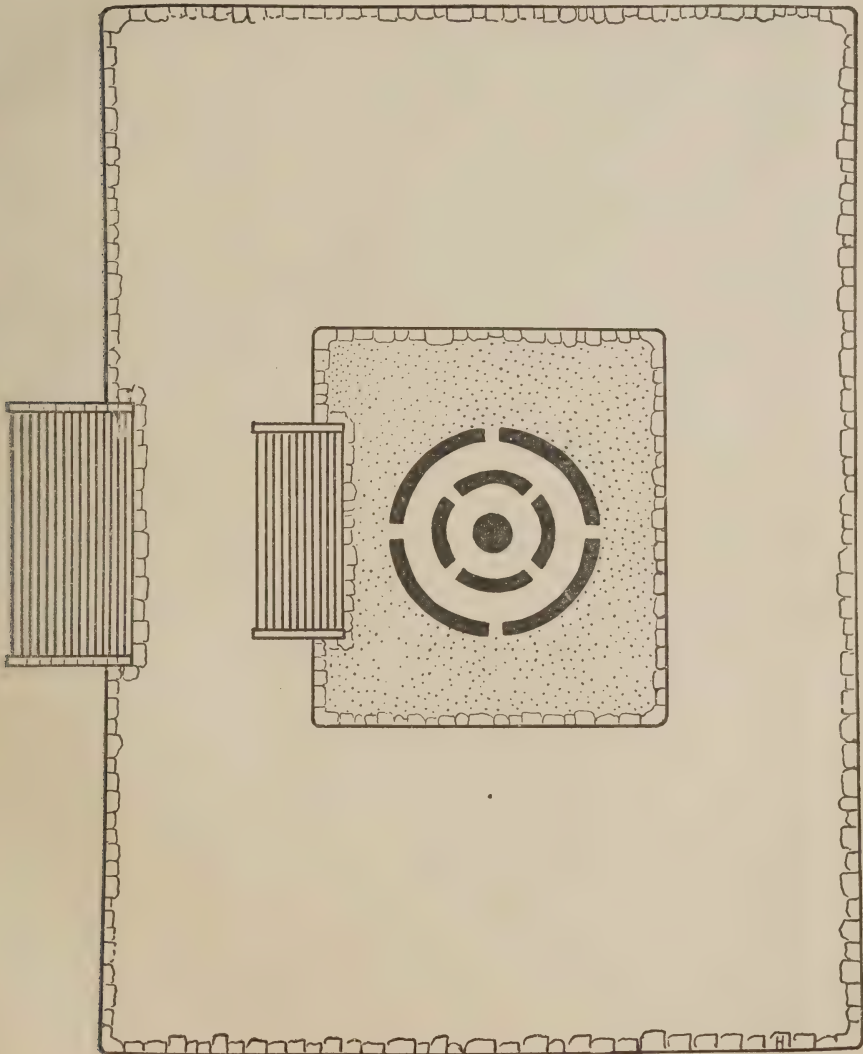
PLAN OF ROUND TOWER OR CARACOL.
